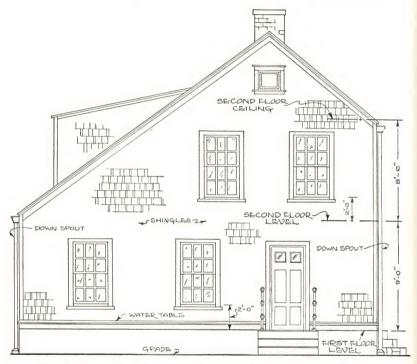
Remodeled Left-Side Elevation for House Shown in Figs. 96, 97 and 98
